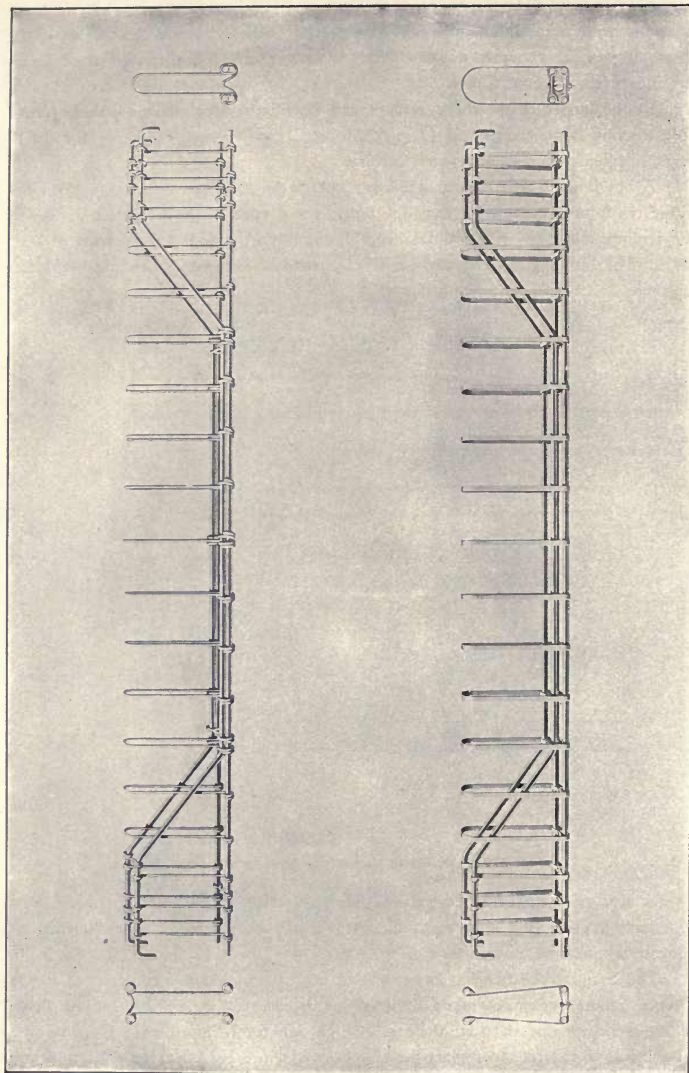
Unit Girder Frame System. (See p. 188.)
